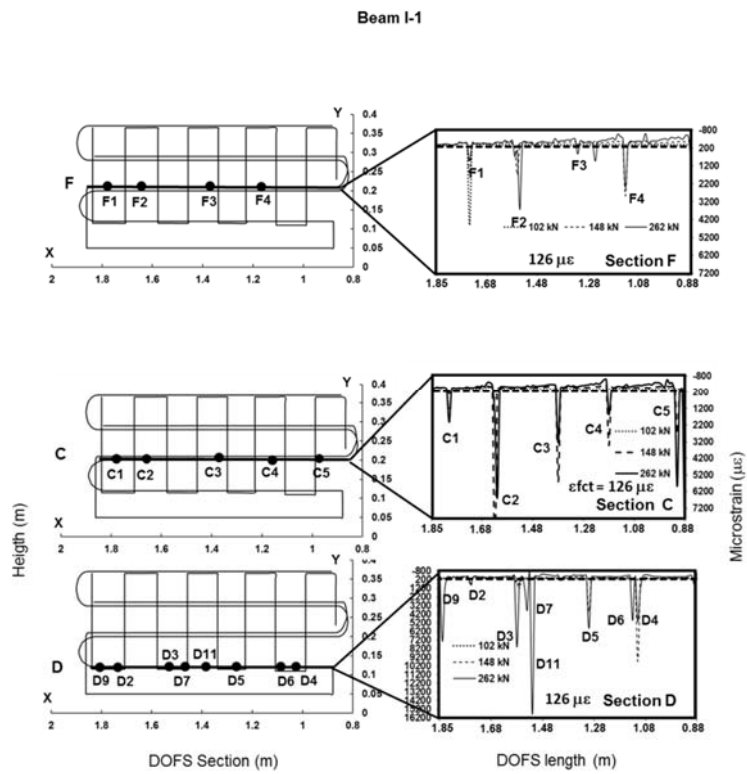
Strain distribution and crack location in horizontal sections F, C and D of beam I-1 at different load levels.
